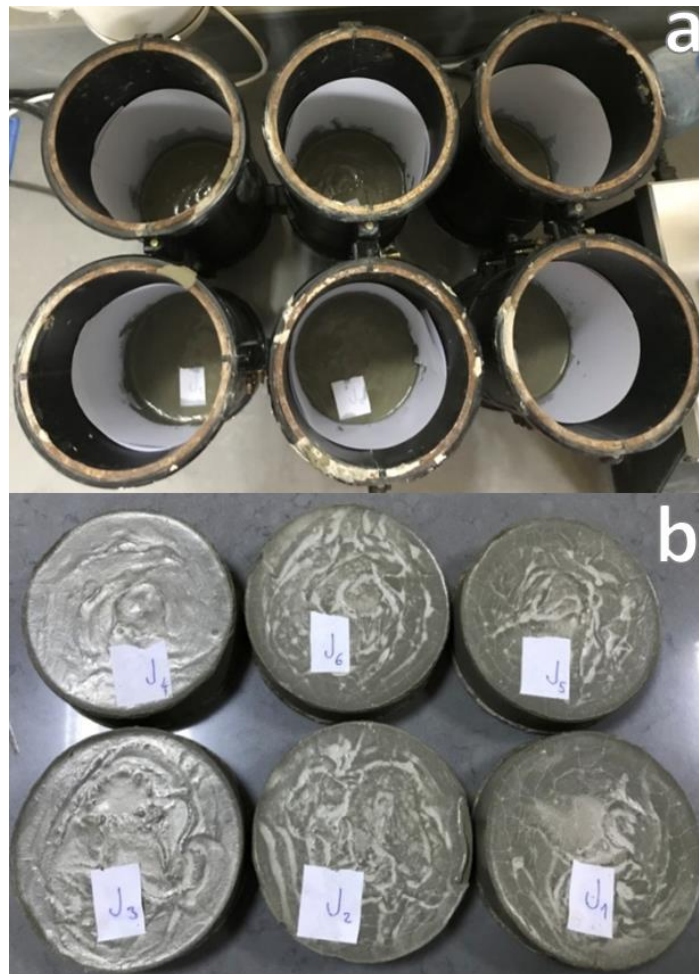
a) Specimen after molding and b) de-molded specimen after curing
